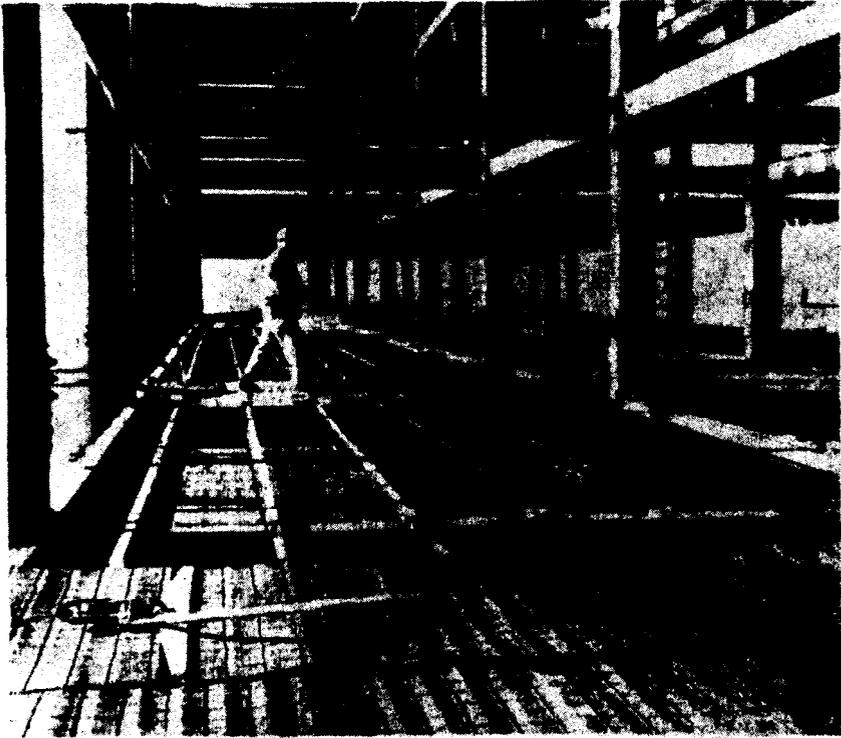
OPEN WEB FLOOR JOIST INSTALLED AND BRACED
